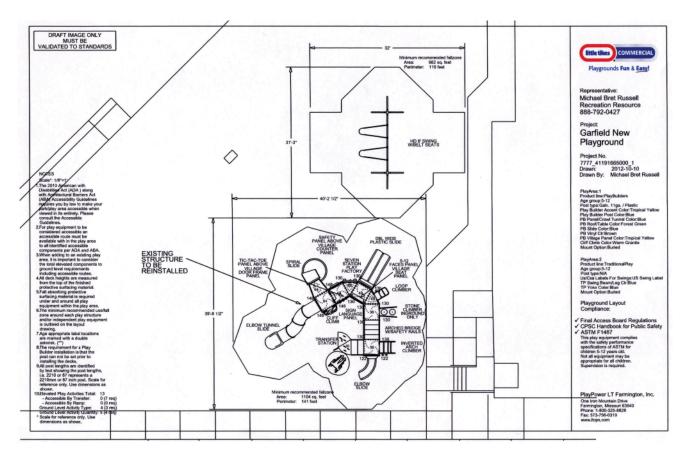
Early Childhood/Kindergarden Stationary Play Equipment Plan
